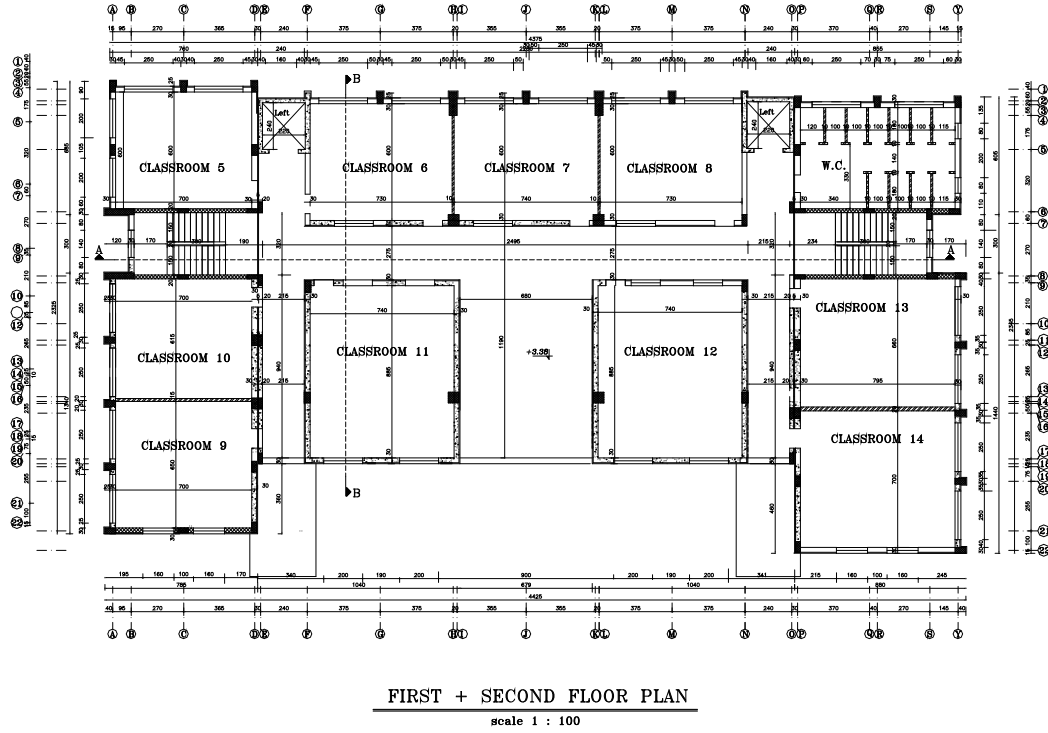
FIRST&SECOND FLOOR ELEVATION
